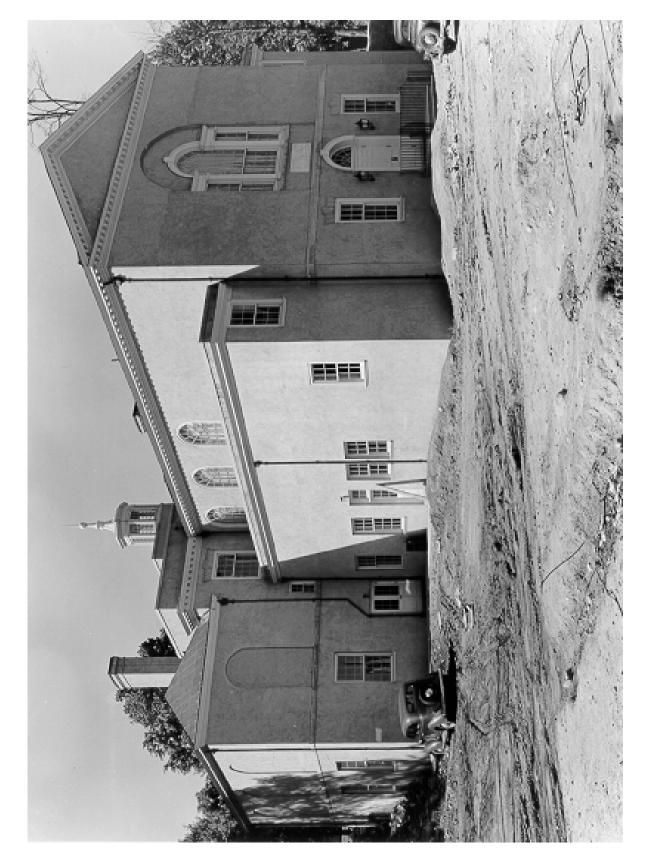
Morristown Museum Building: north and east elevations of newly completed building (ca. March 1937).
